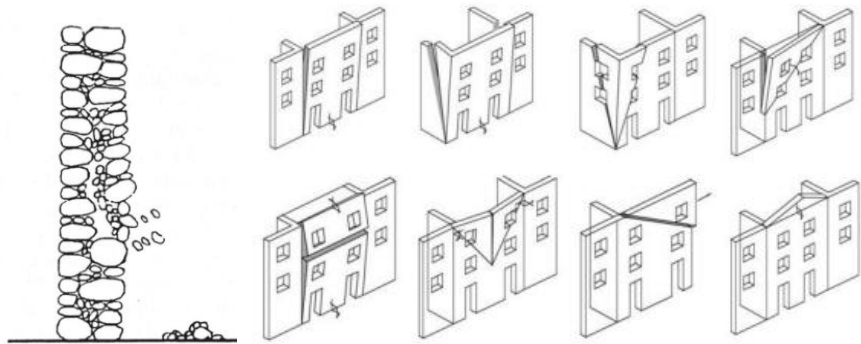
Crumbling in masonry wall [Giuffr  1993] (left)
